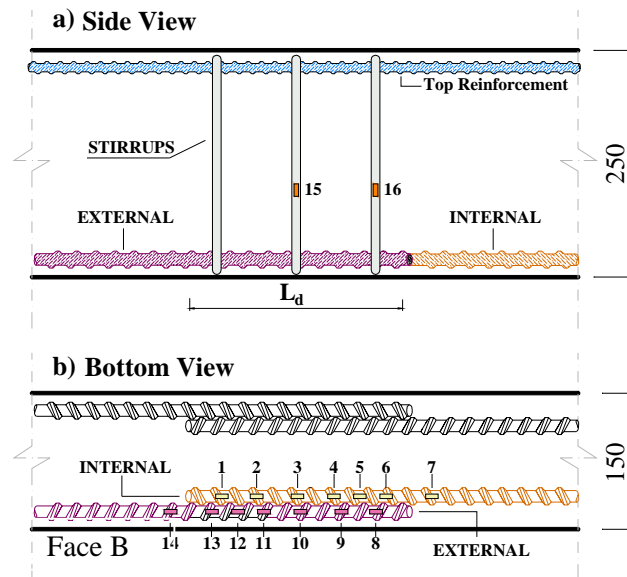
Arrangement of strain gauges on the splice and stirrups
